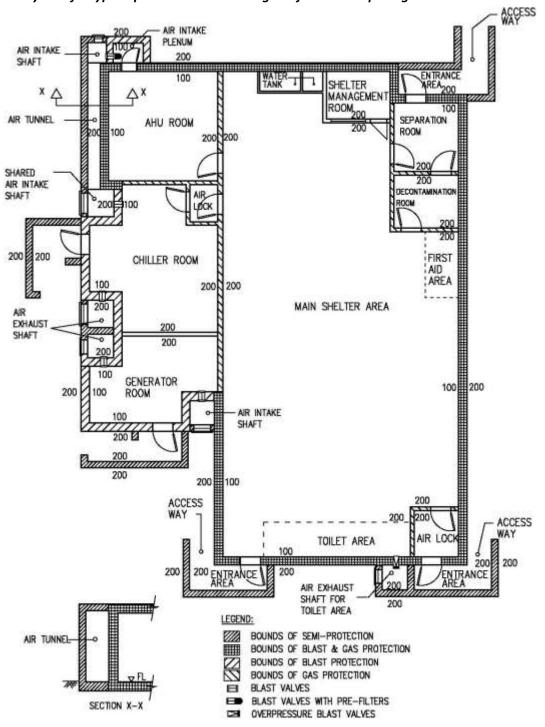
Layout of a typical public shelter showing reinforcement spacing
